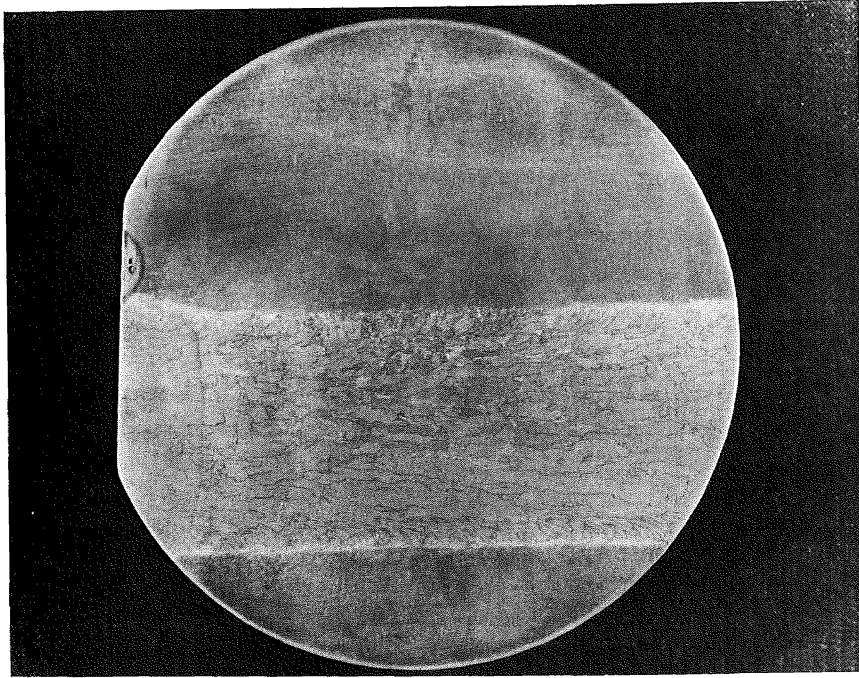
Core removed from northbound girder G4 W2A showing repair weld on flange tip crack.
